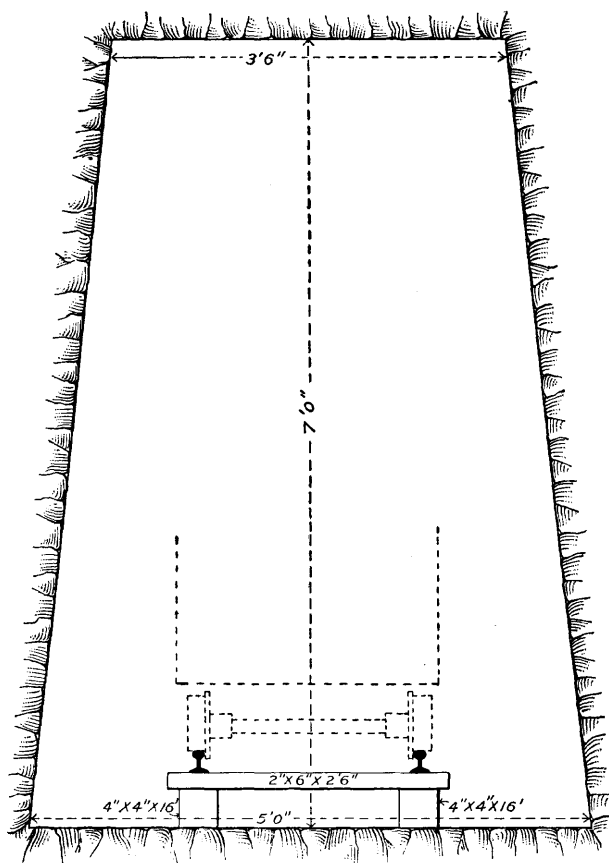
Section of new Santa Barbara tunnel in solid rock.
